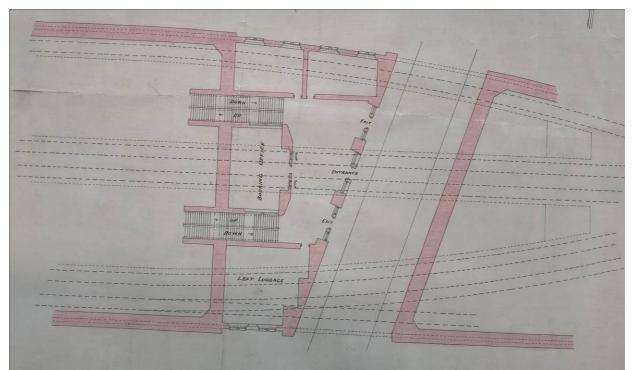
1894 plan of the ground floor booking hall and Church Street by Charles Foreman, Engineer.⁶⁶
